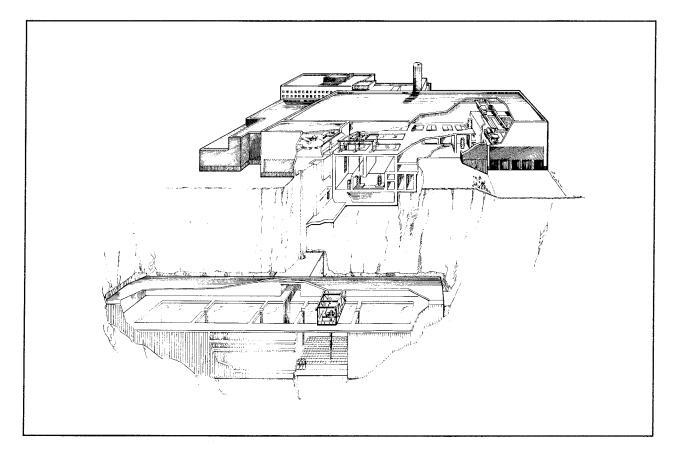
Plan of receiving building and rock cavern in the central interim storage facility for spent nuclear fuel, CLAB.
